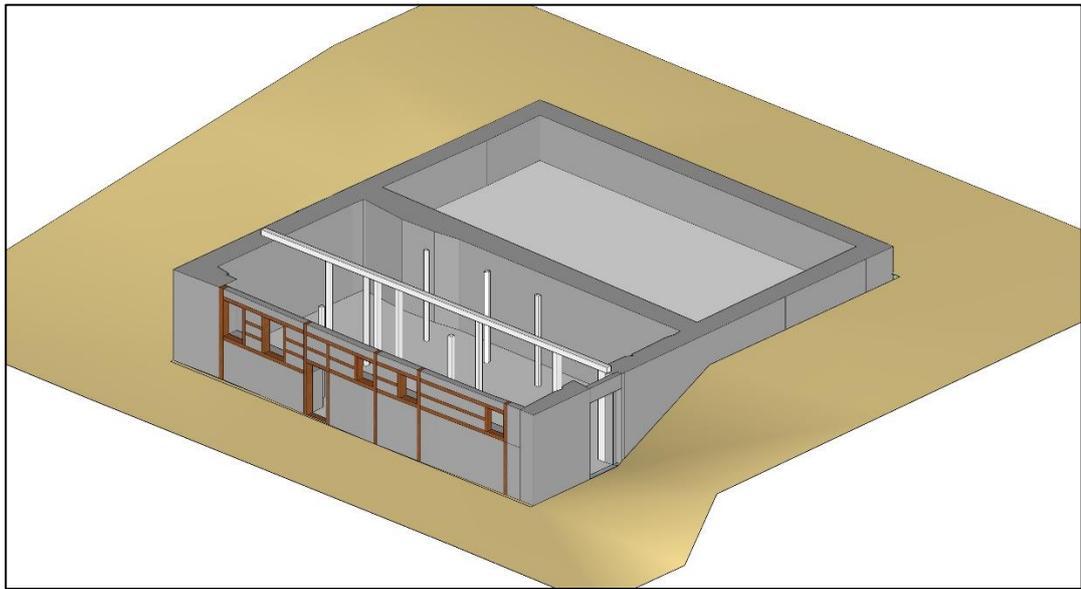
Timber frame lower wall of the ground floor of Şenköy 3
